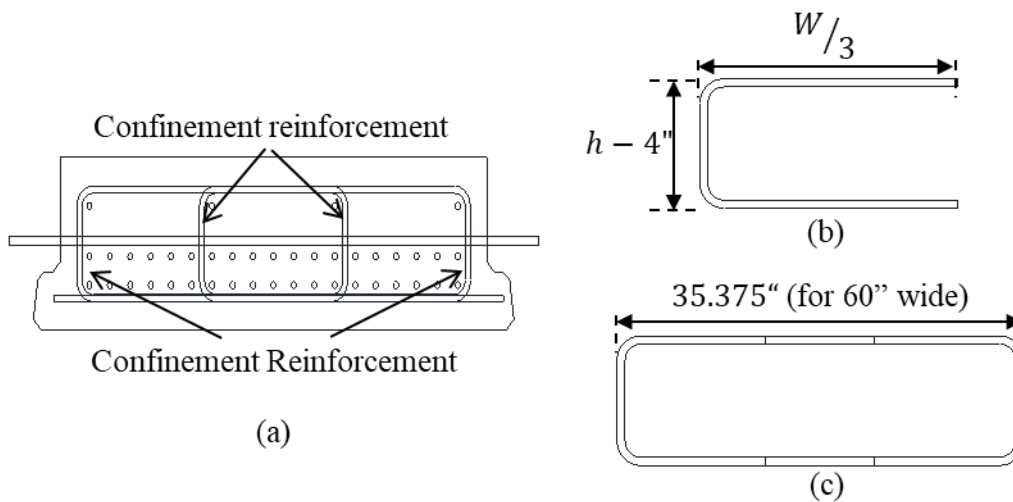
(a) Proposed slab-beam confinement reinforcement (FDOT 1 shown – others similar), (b) confinement stirrup, and (c) Alternate 2 dimension of stirrup loop (two loops needed – others similar)
